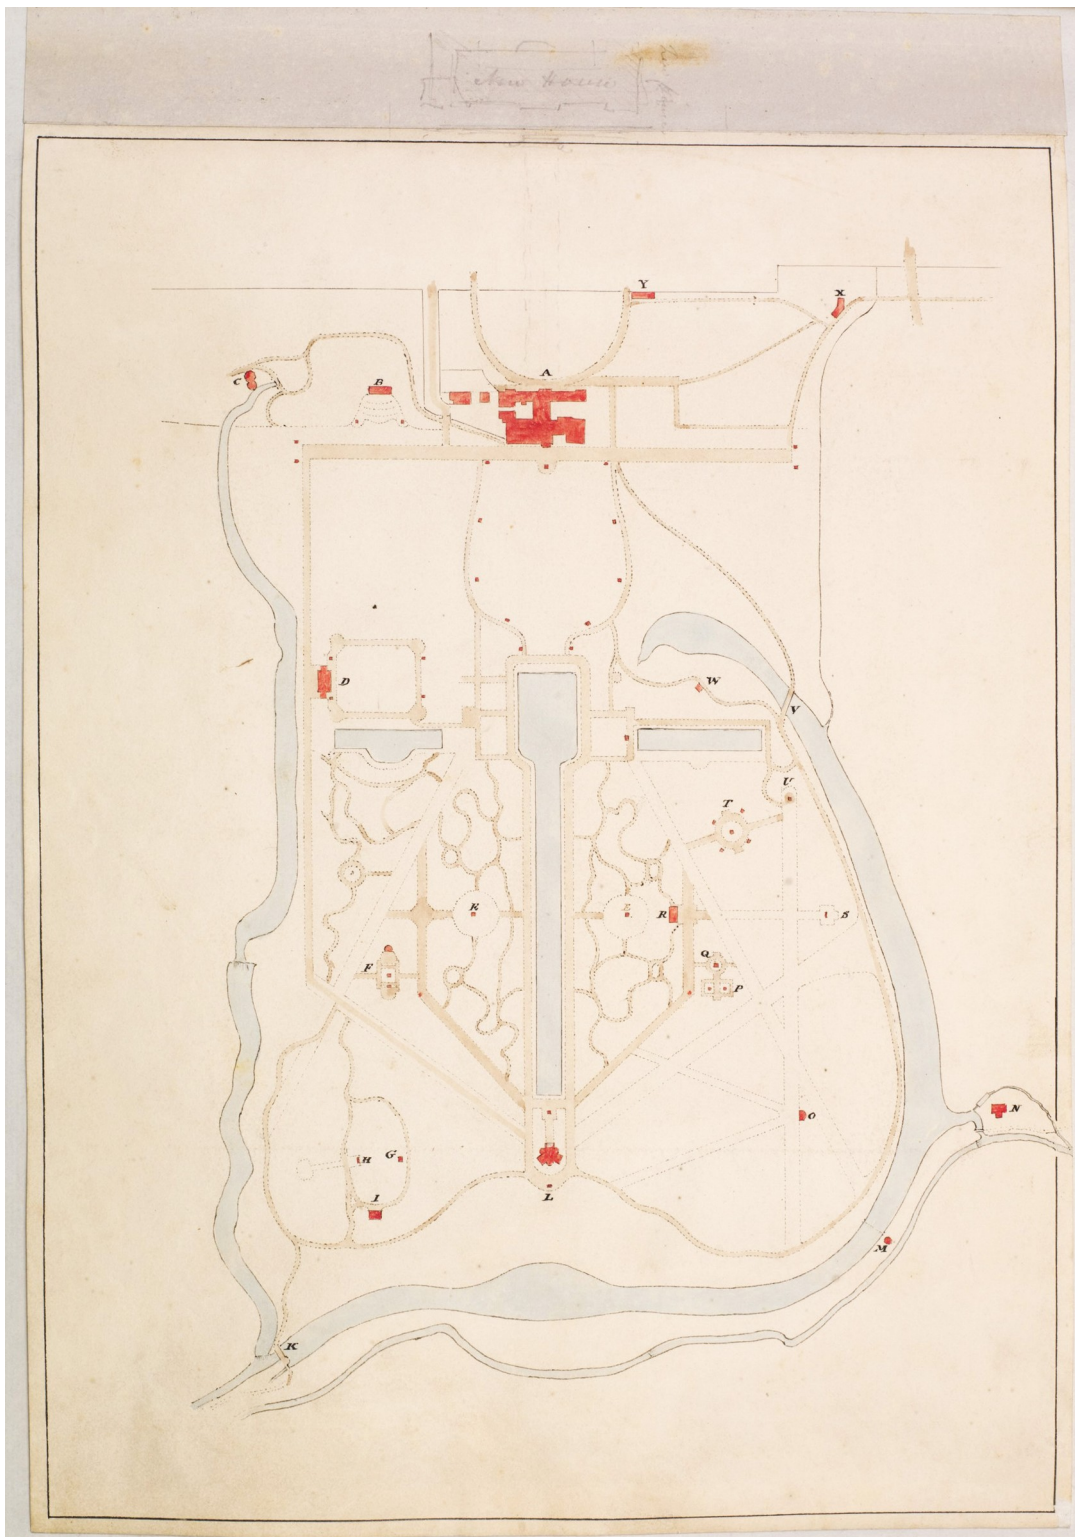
Site plan by de Grey dated 1831. It shows the extent of the gardens and a sketched outline of the new house to the north. Private collection.
